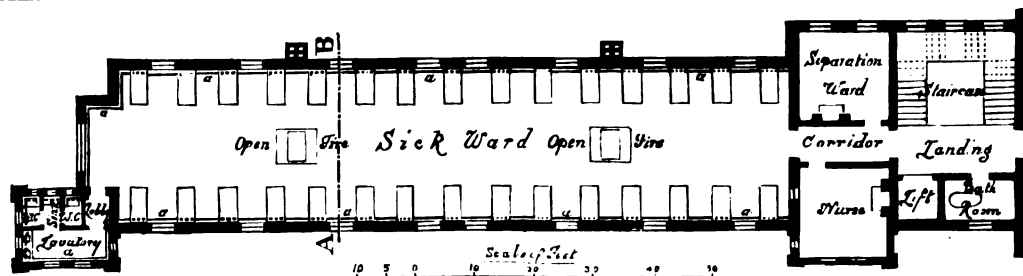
PLAN OF FIRST FLOOR, S. E. WING.
